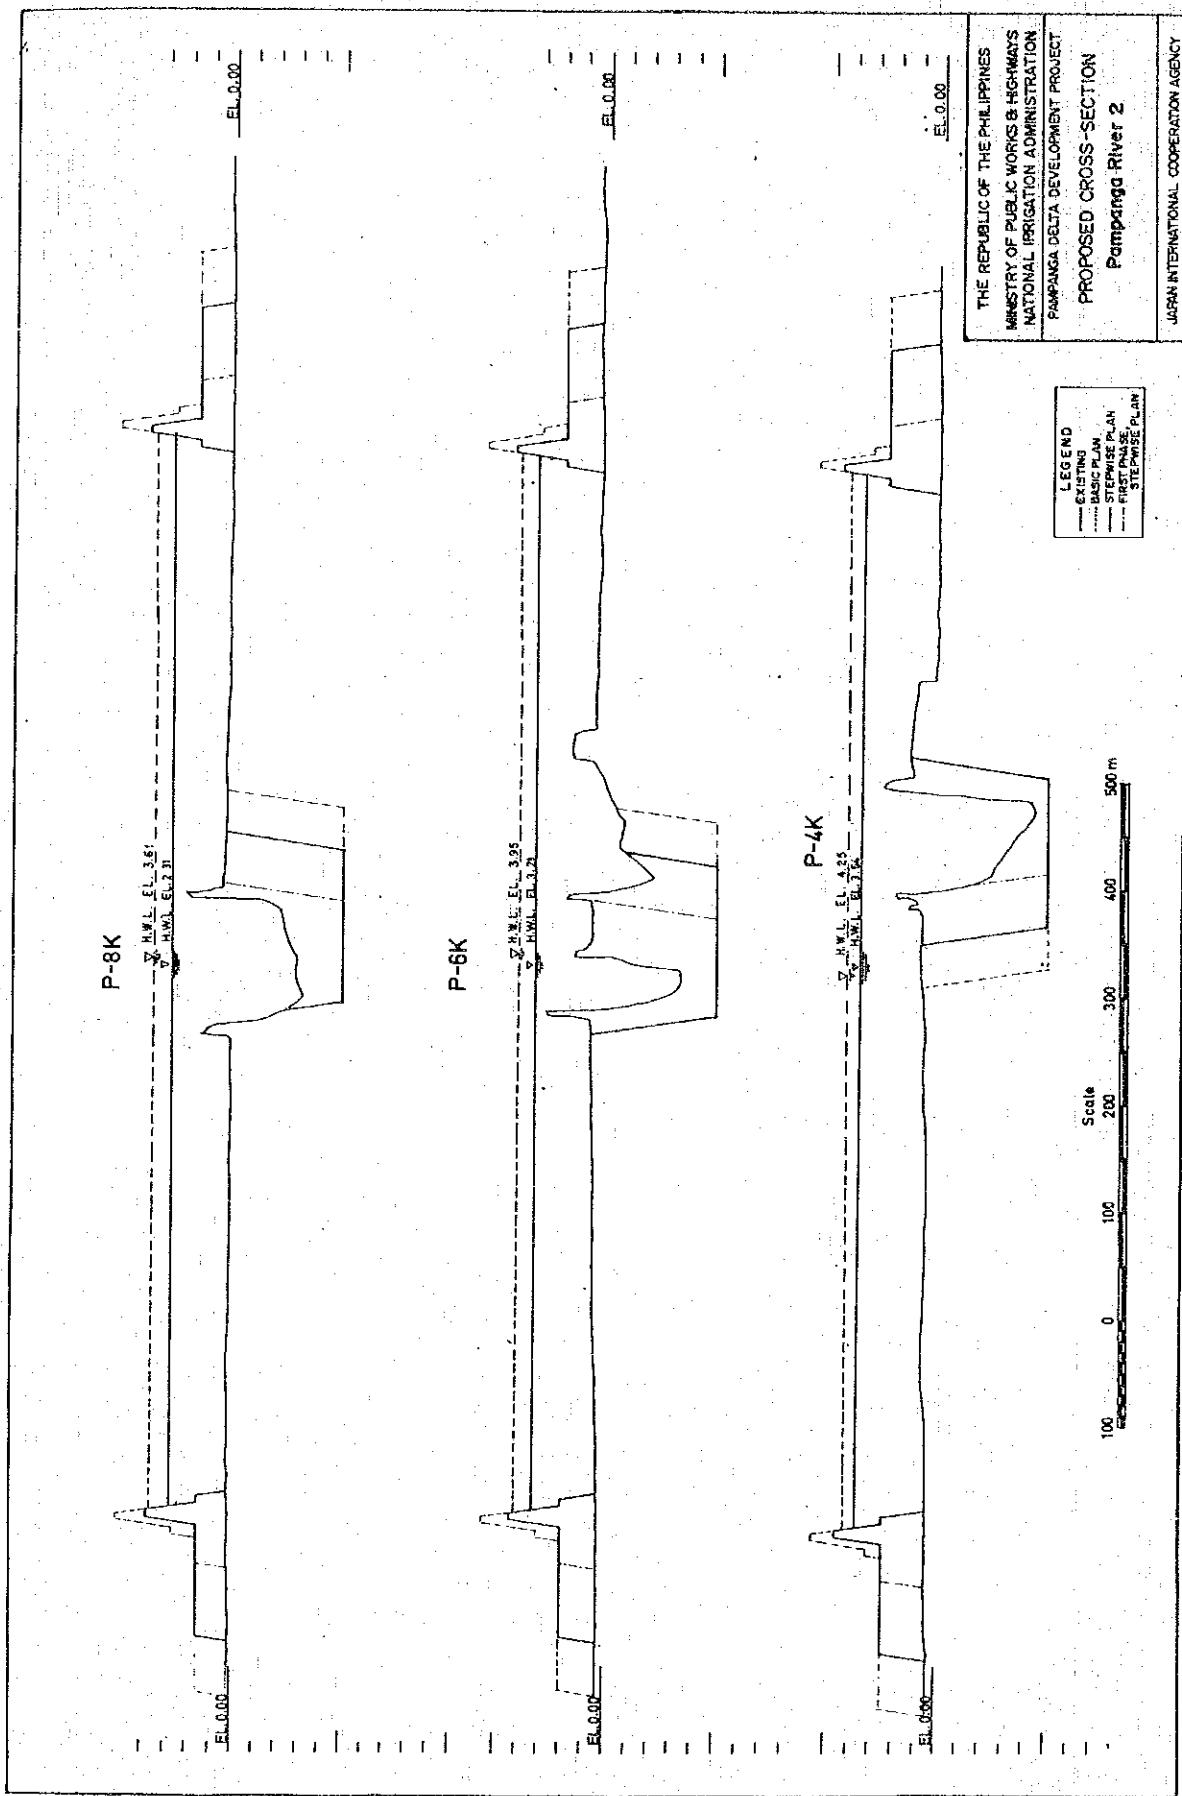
(3) PROPOSED CHANNEL CROSS-SECTION
